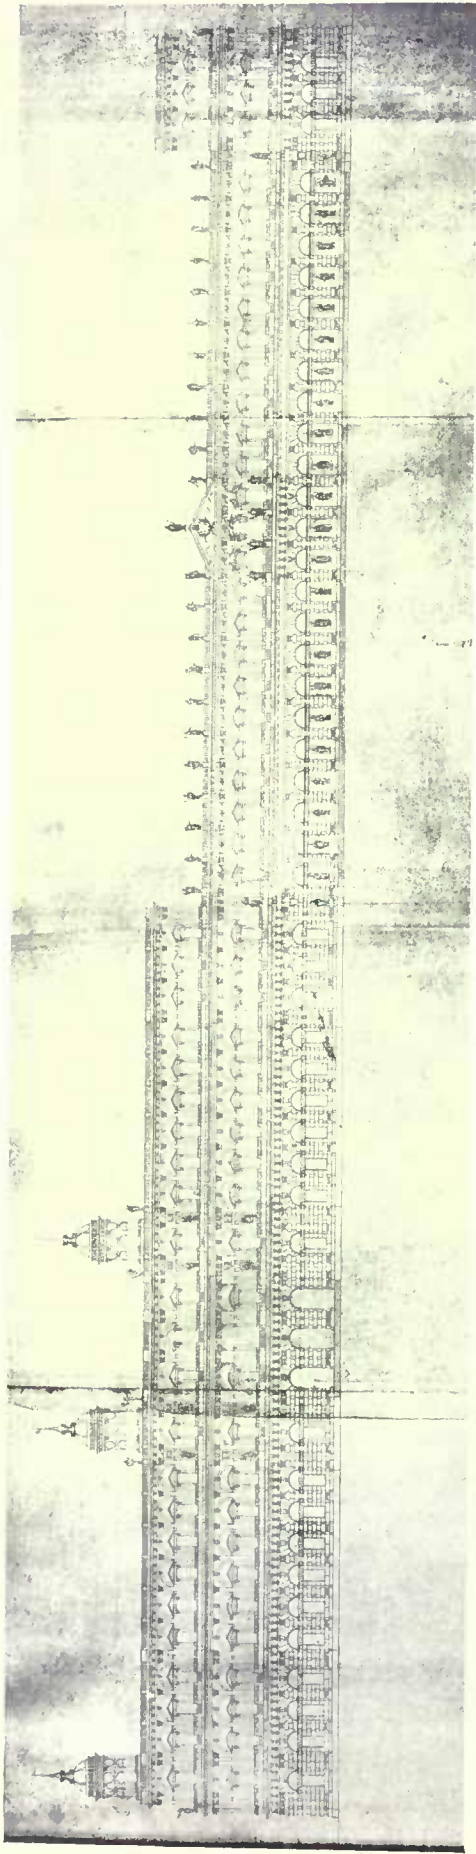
SOUTH ELEVATION OF AN ALTERNATIVE DESIGN
